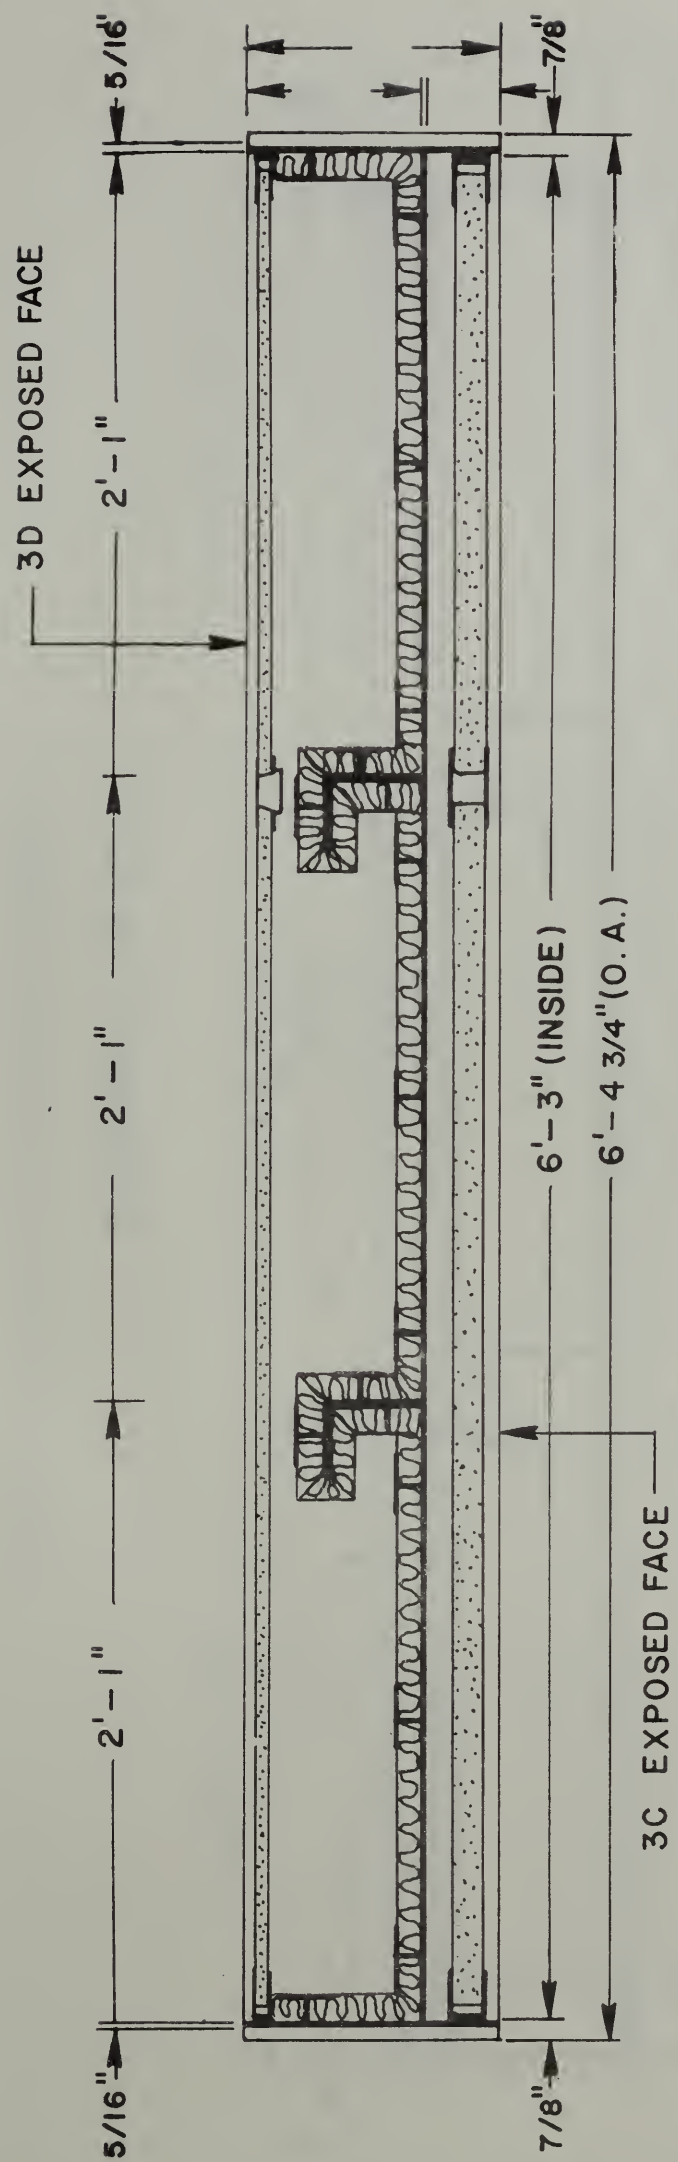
HORIZONTAL CROSS SECTION OF ASSEMBLY 3
